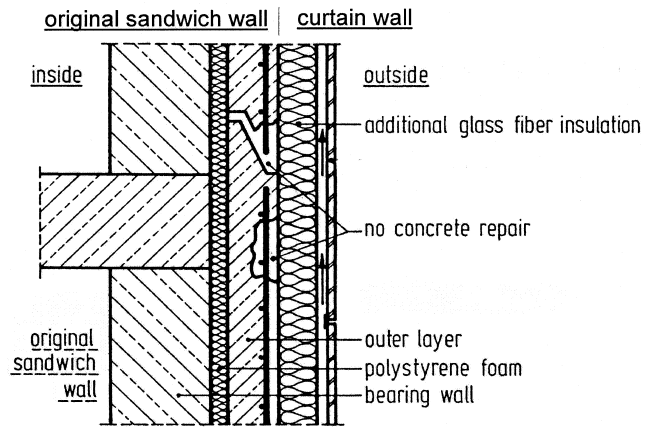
Concrete sandwich wall repaired using additional curtain wall.
